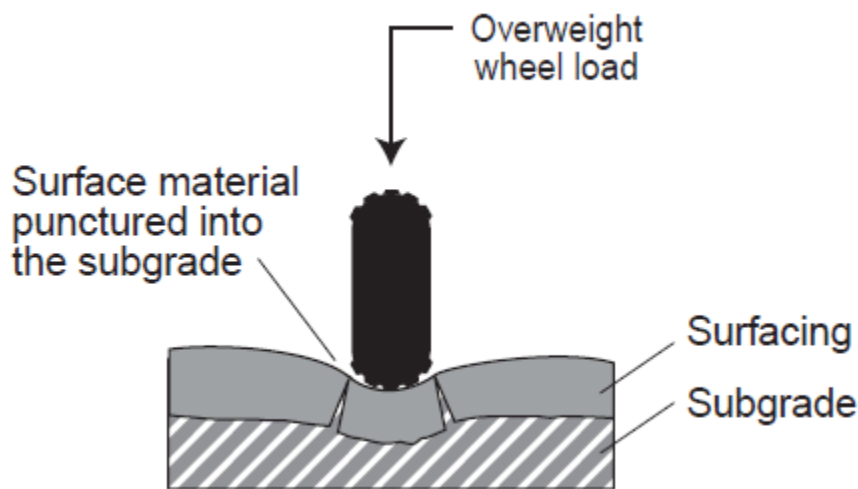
Shear failure of a road surface because of overweight wheel loads.
